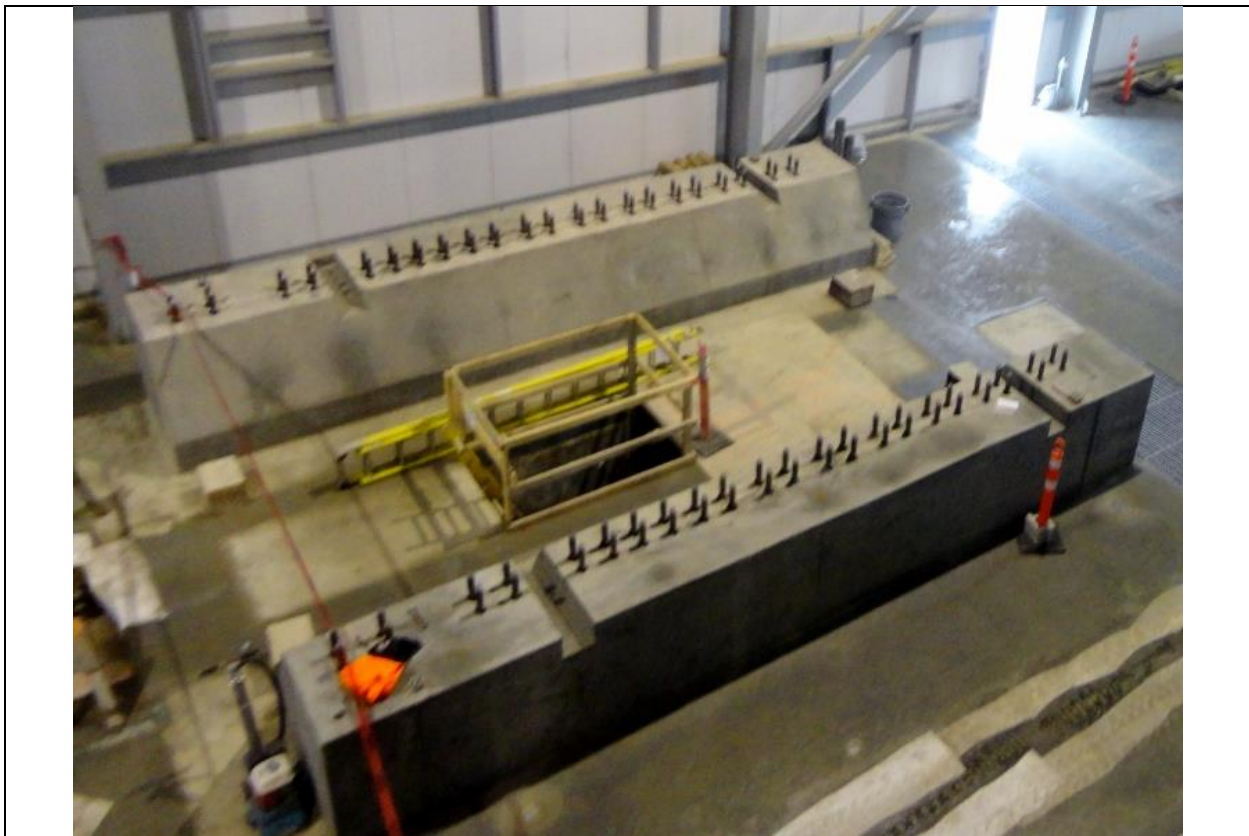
Soldiers Pond – Interior view of Control Building. (July 15, 2016)
